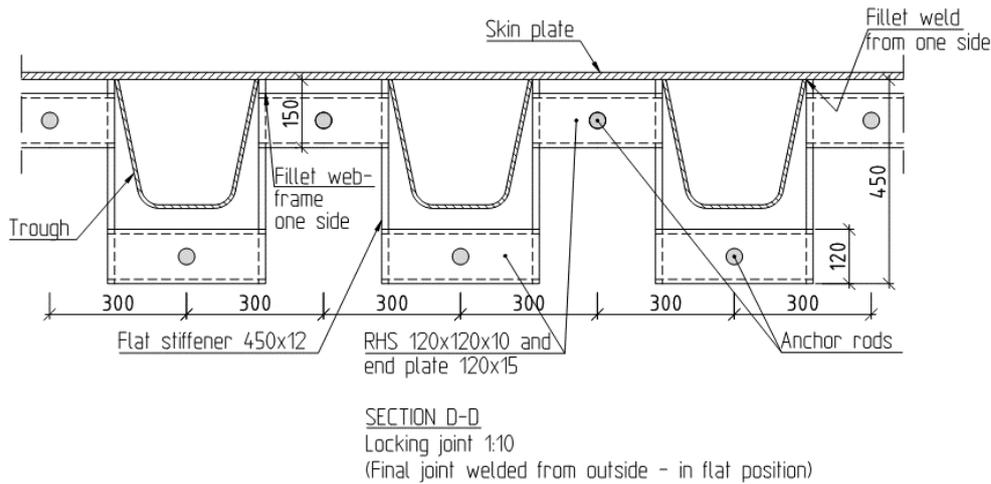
Locking joint for deck plate, construction joint 1 & 2, transverse section
